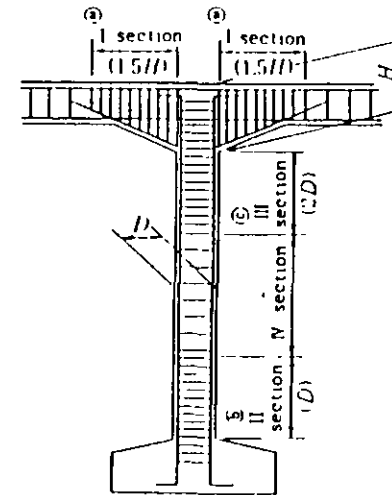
Reinforcement Arrangement at Intermediate Joint of Rigid Frame and Bridge Pier
